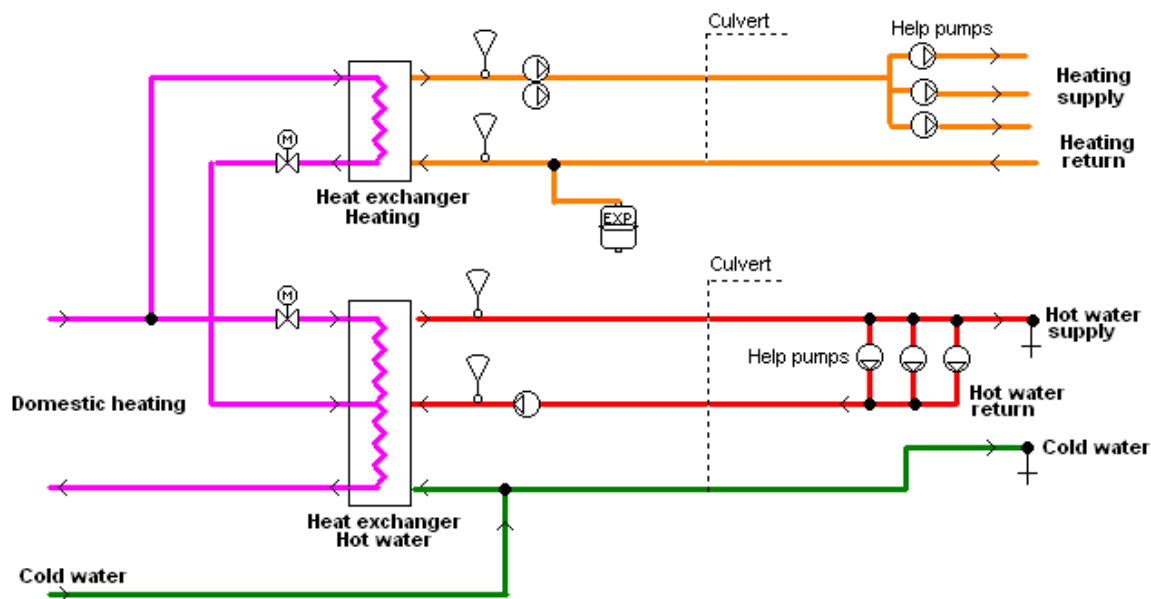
Shows a schematic diagram of the district heating substation in the Vikingavägen 18 building along with the culvert system.
